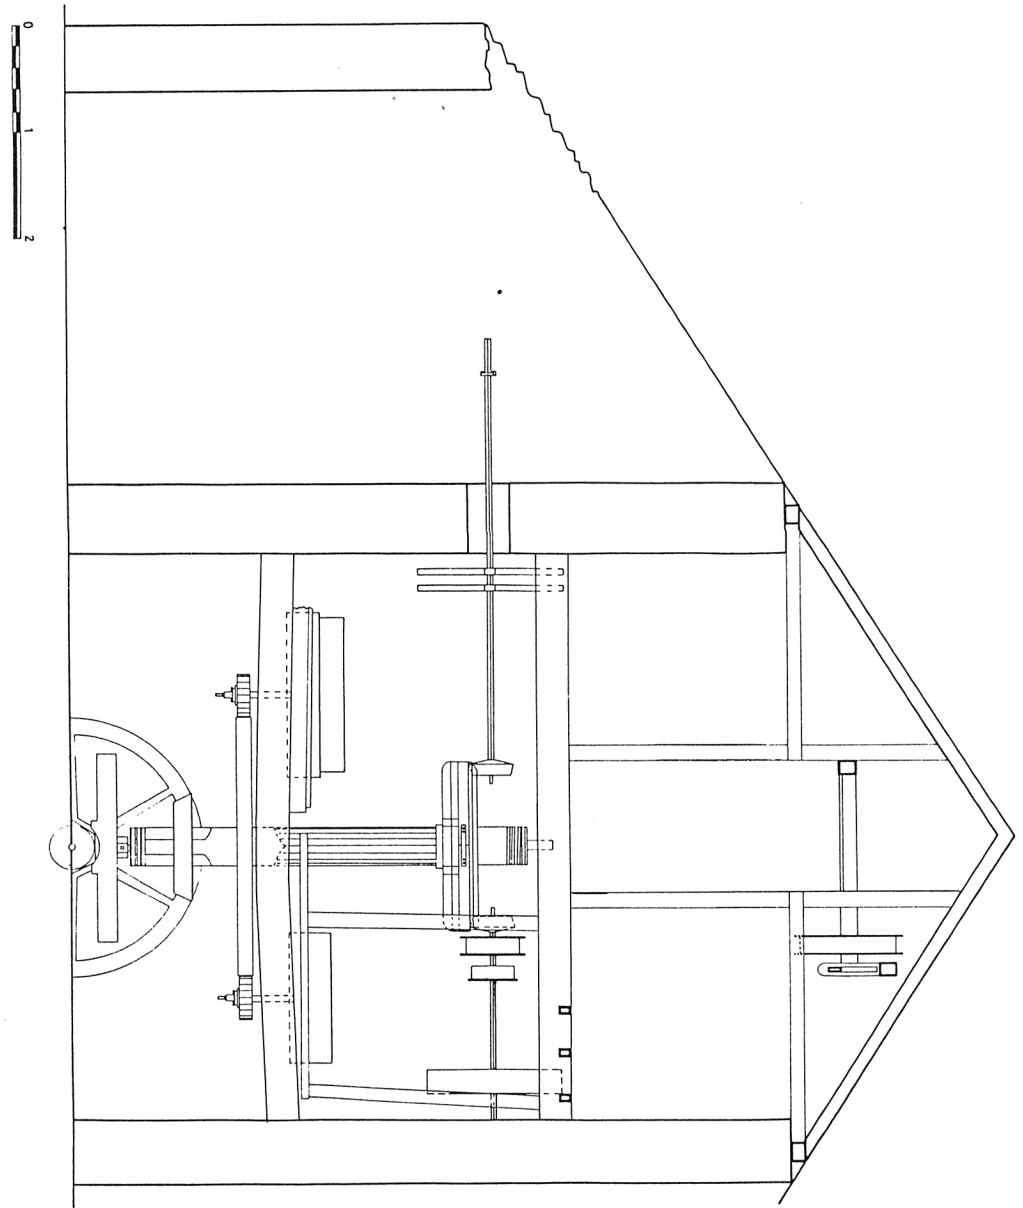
Boughrood Mill. Ground floor sectional plan showing collapsed position of spur and wallower.
